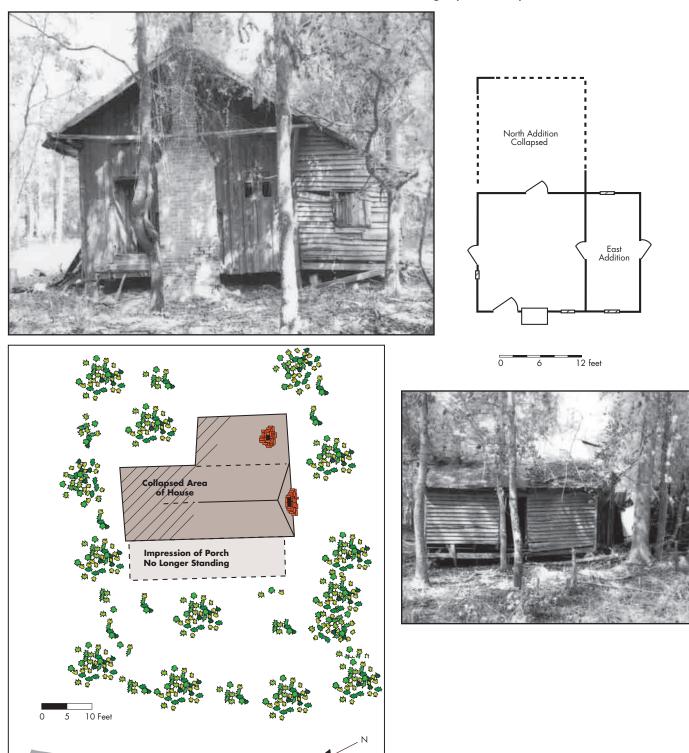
Tenant House 5 Photograph, Floorplan, and Site Plan
